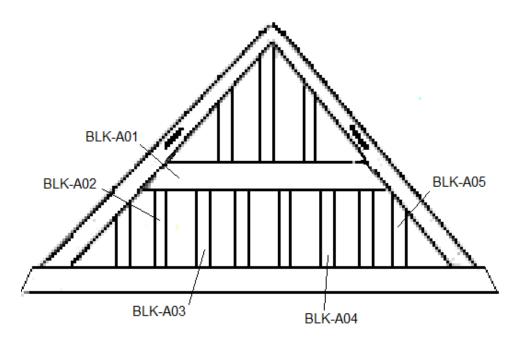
Sketch of truss 1, showing the location of samples BLK-A01–05
